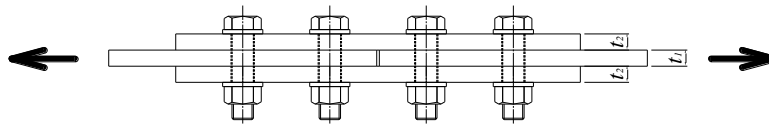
Butt Joint with Two Friction-Surfaces
